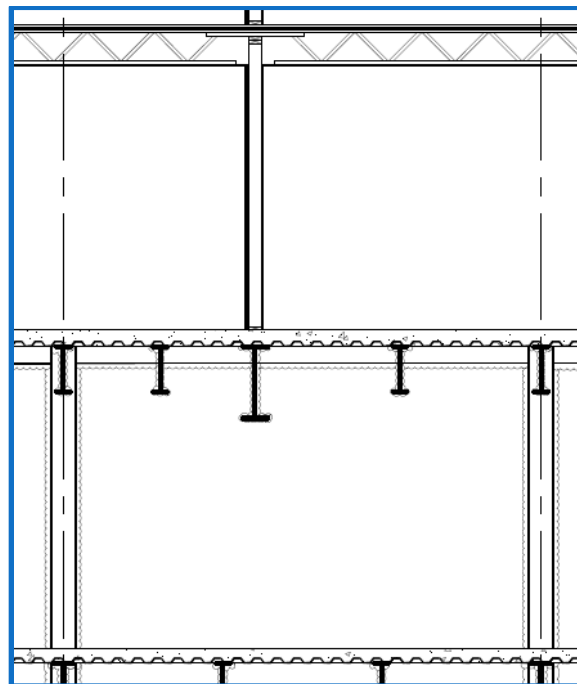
Alignment of Bearing Wall and Steel Beam (Architect)
